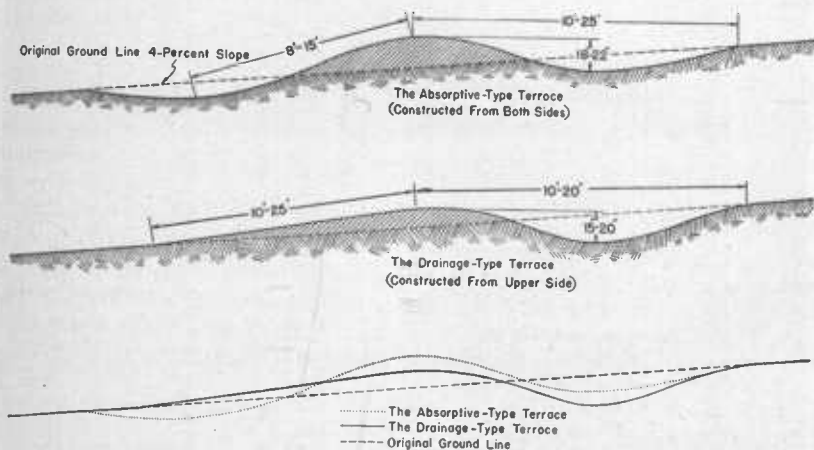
Terrace cross sections after settlement and cultivation.
